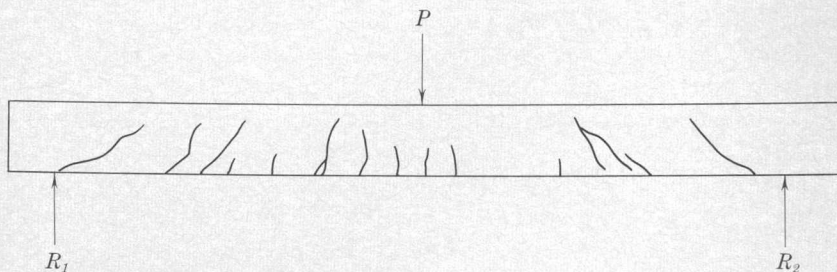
Diagram of cracks formed in a reinforced concrete beam supported at R_1 and R_2 and under load at P . Adapted from Hool (1937, fig. 45); published by permission of McGraw-Hill Book Co.
